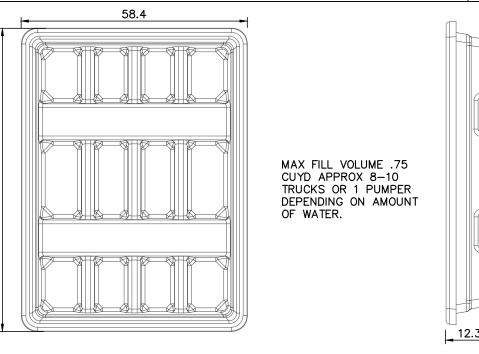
ABOVE GRADE, PORTABLE CONCRETE WASHOUT
